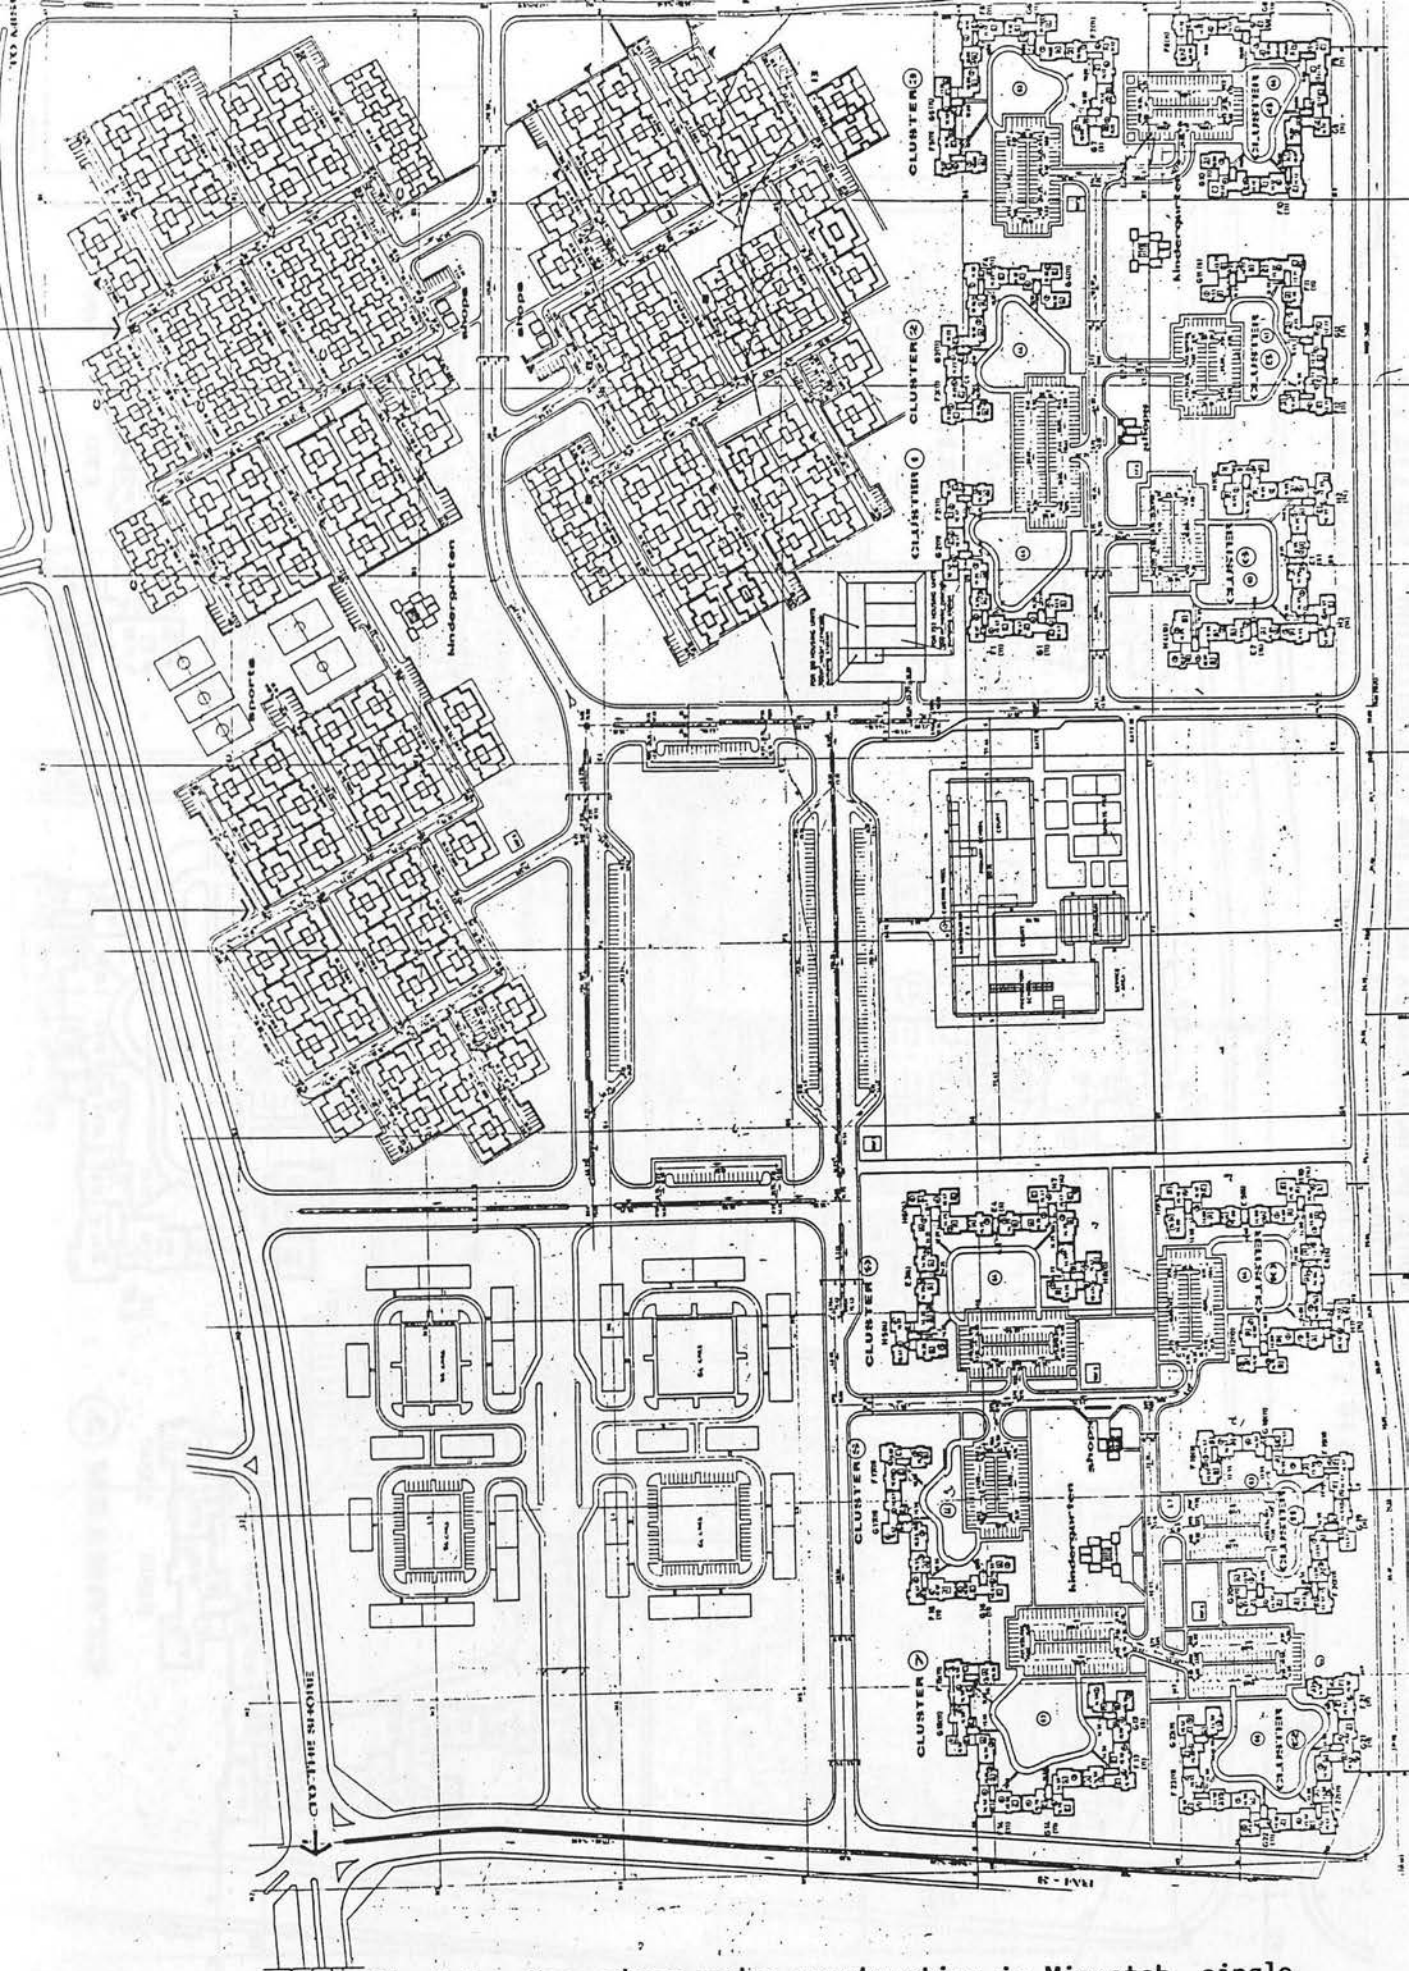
New scheme under construction in Misratah, single storey houses are positioned close to four storey blocks
